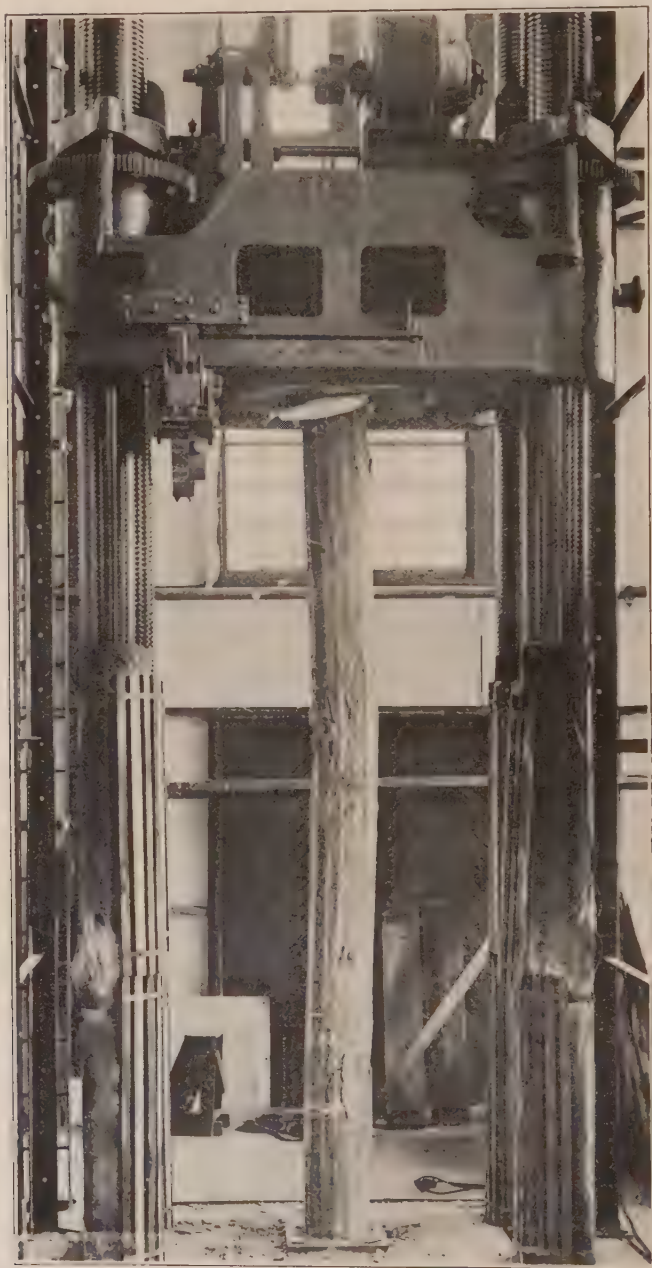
CAST-IRON AND CONCRETE COLUMN IN TESTING MACHINE.
